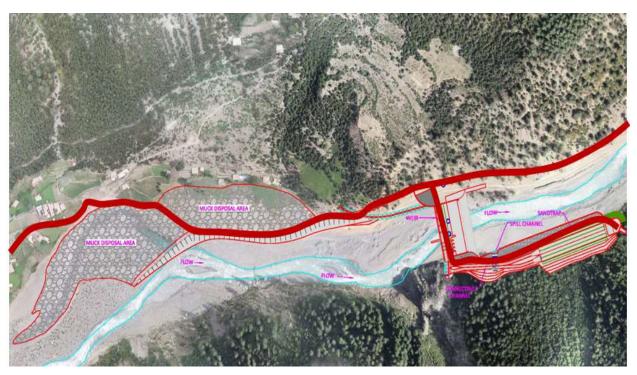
location of Muck Disposal sites and Access Roads (in dark red color)
